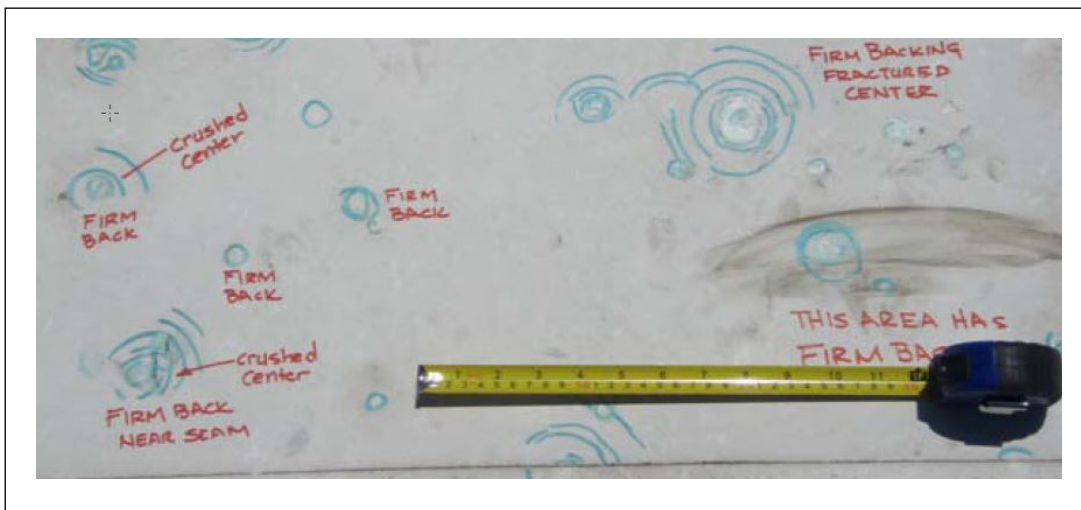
Close-up of hail damage in Figure 3.5.2-1
